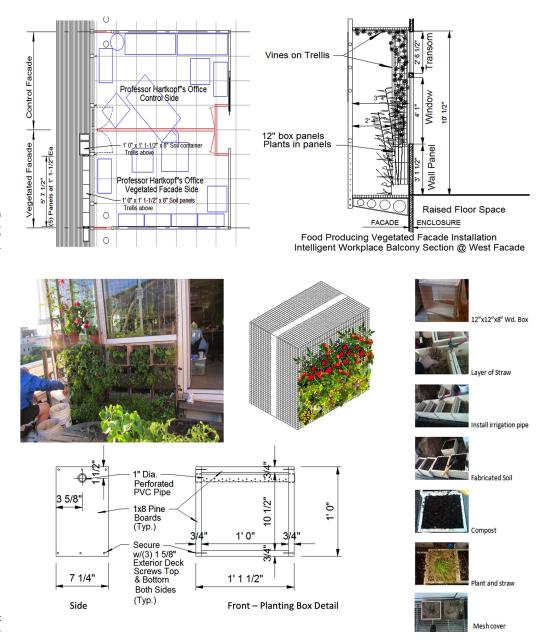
West façade research bay floor plan. Figure 6. West façade section @ living facade.
